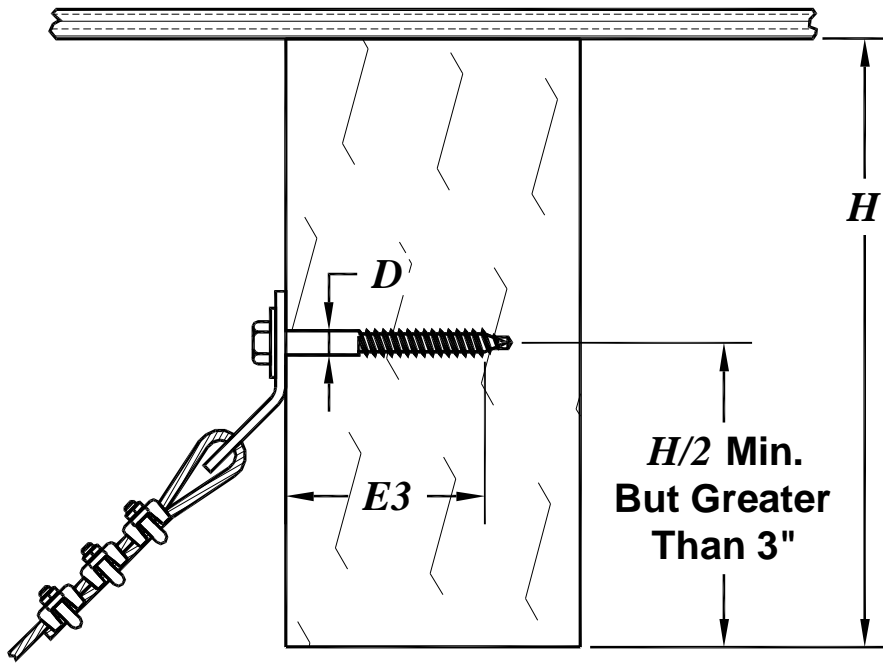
; KSCC Attached to a Wooden Joist or Beam in Orientation 2 Using a Lag Screw
